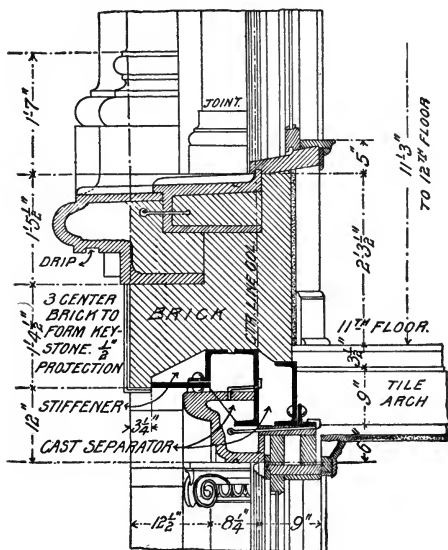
Spandrel Section, Eleventh Floor. Fort Dearborn Building.
